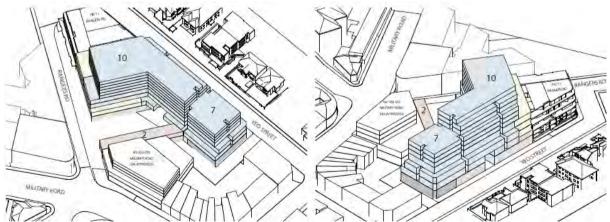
Proposed building massing diagrams (source: Applicant's Urban Design Report, p. 28)
